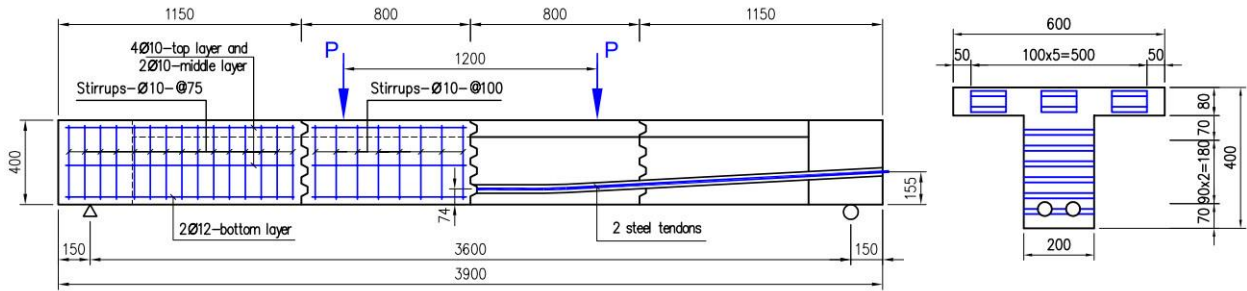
Detailed dimensions of the tested beams in Le et al. [2]
